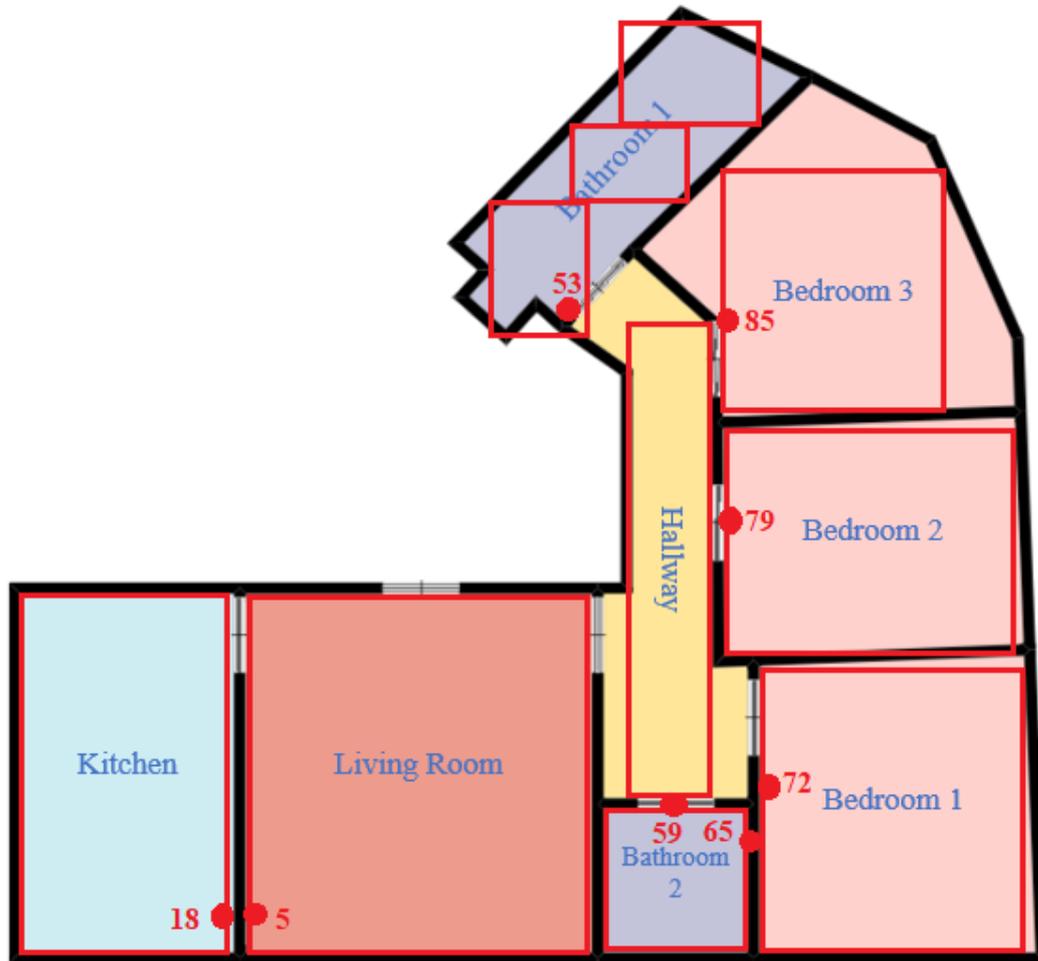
House Floor Plan with Sensors and Activation Areas
